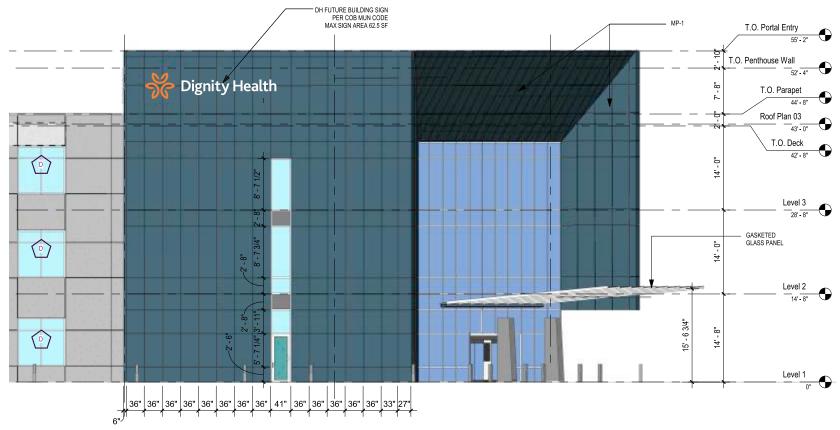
Exhibit B (Comprehensive Sign Plan No. 20-0180)
